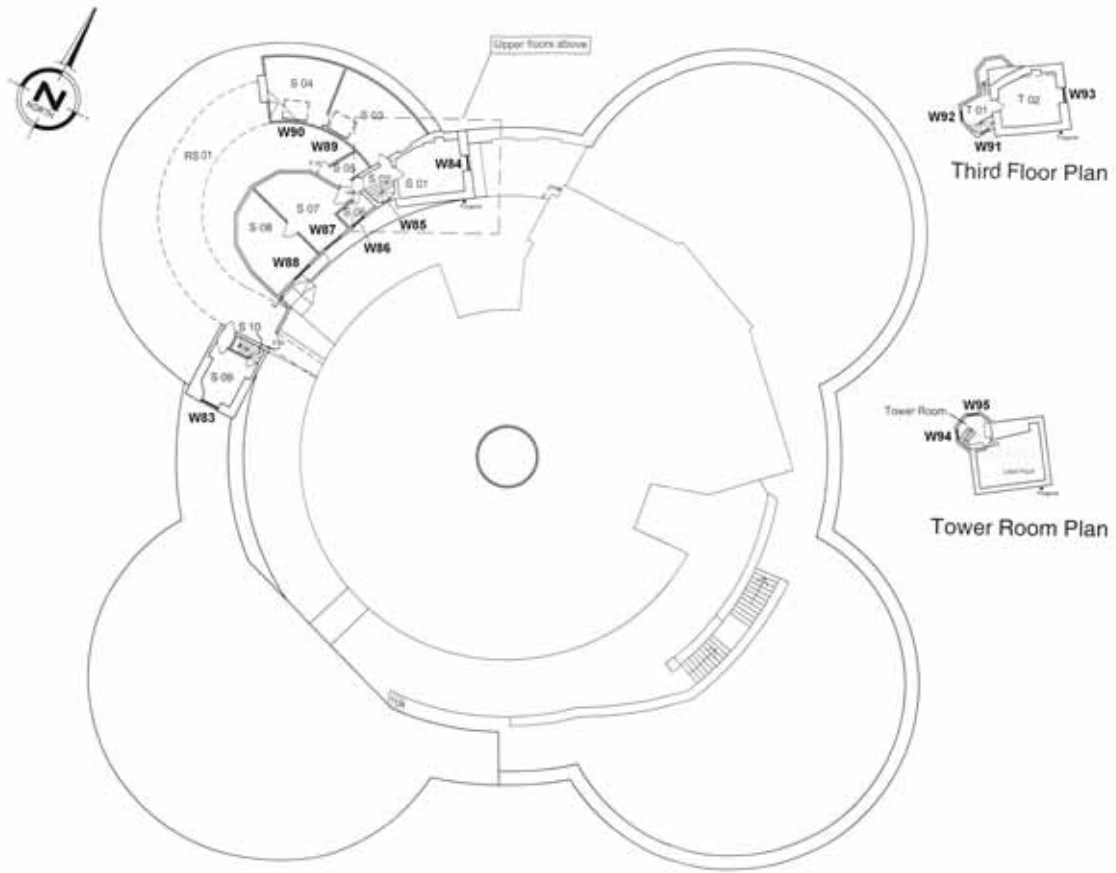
Second and upper floors plan of Walmer Castle (© Broadway Malyan)
